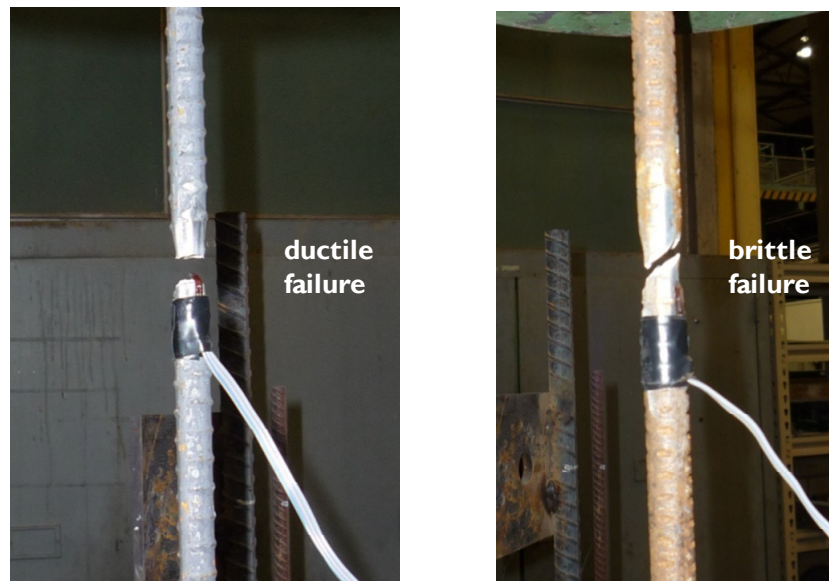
Failure modes for Grade 60 rebar (left) & deformed wire (right)
